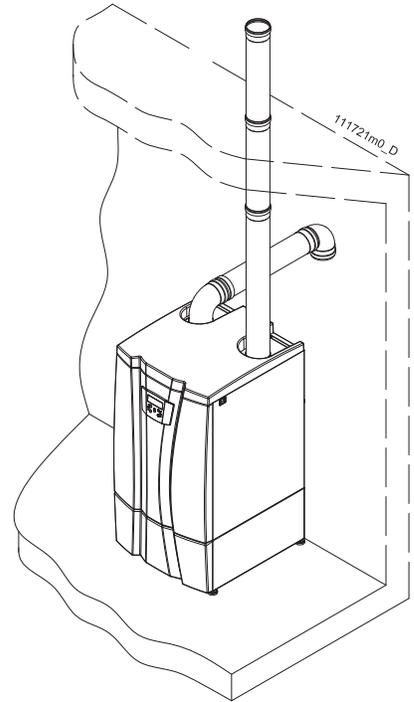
Side wall air intake, vertical vent (Direct venting).
